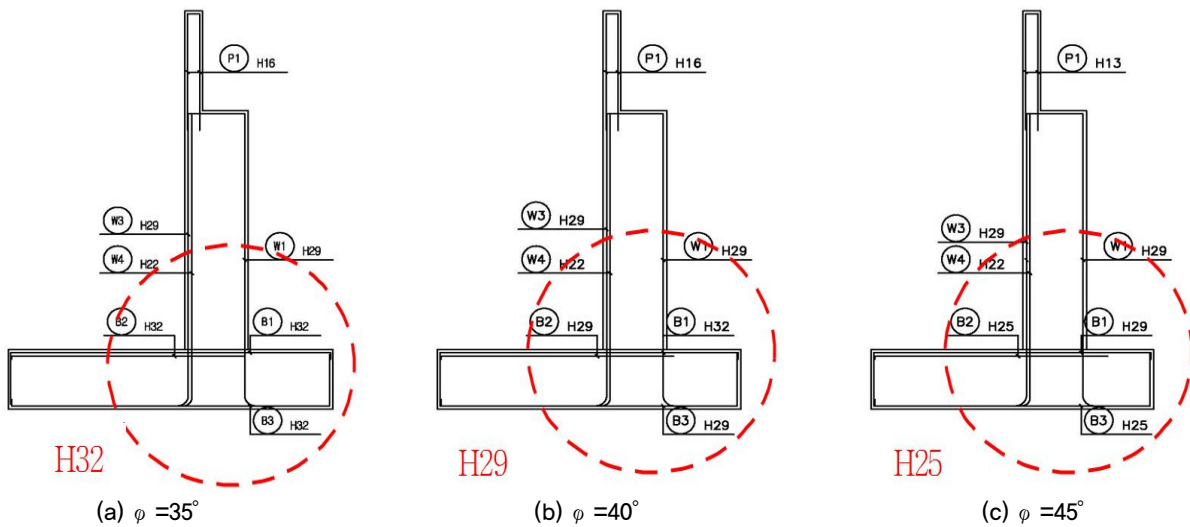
Assembly drawing of a main Reinforced Steel Bar
